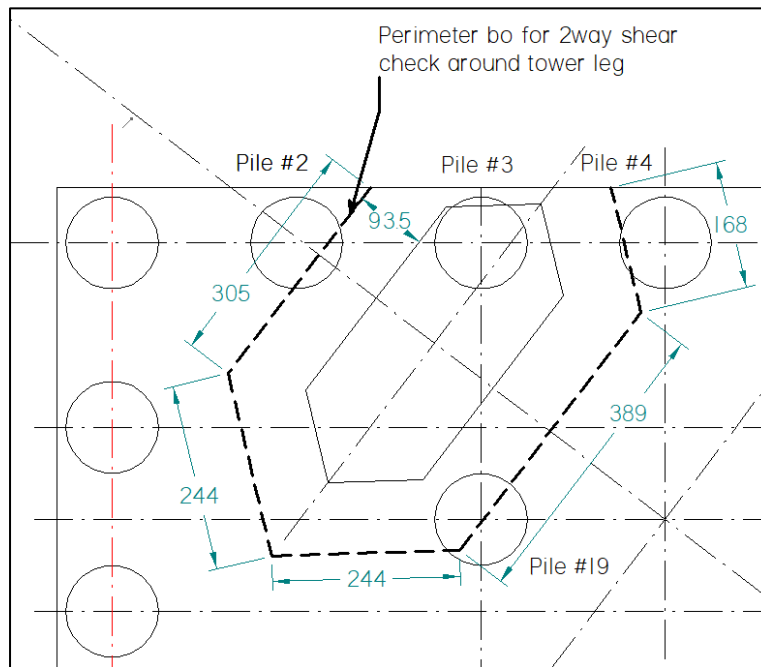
Detail of Critical Perimeter  $b_o$  for 2-Way Action: Dimension, Distance to Tower Leg, Intersection with Drilled Shafts.
